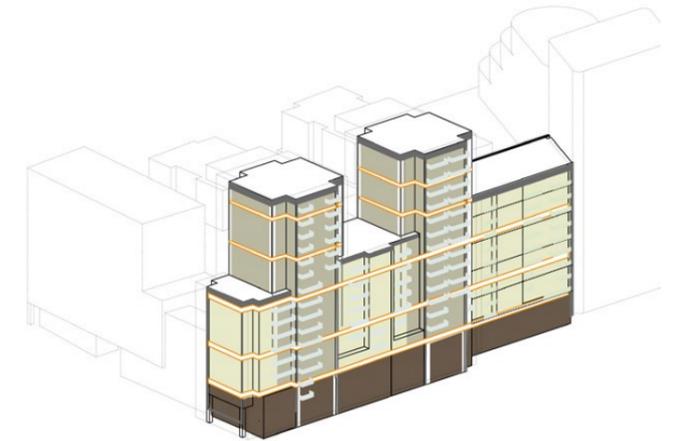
Building B2B3 articulation - A darker brick treatment to the base to celebrate horizontality.
